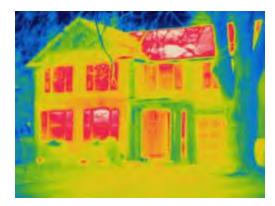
House with poor roof insulation¹, red indicates warmer areas while blue shows cold areas.
